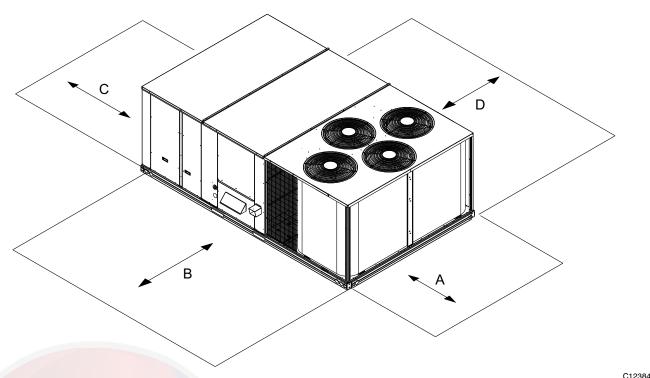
(cont.) - Unit Dimensional Drawing - 24 and 26 Size Units, Sheet 3 of 3
